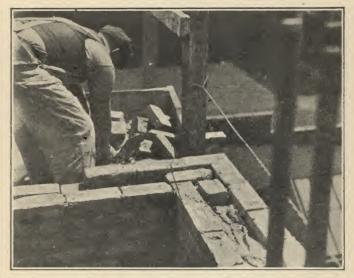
Building a wall by the grouting method. Inner and outer tiers are first laid with shoved joints.
